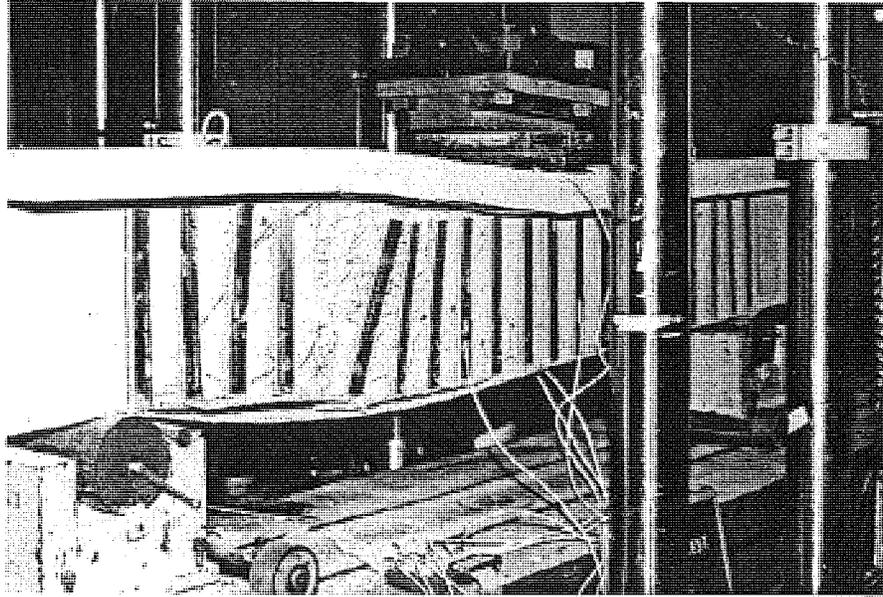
Shear failure due to delamination of CFRP strip in Beam No. 6
